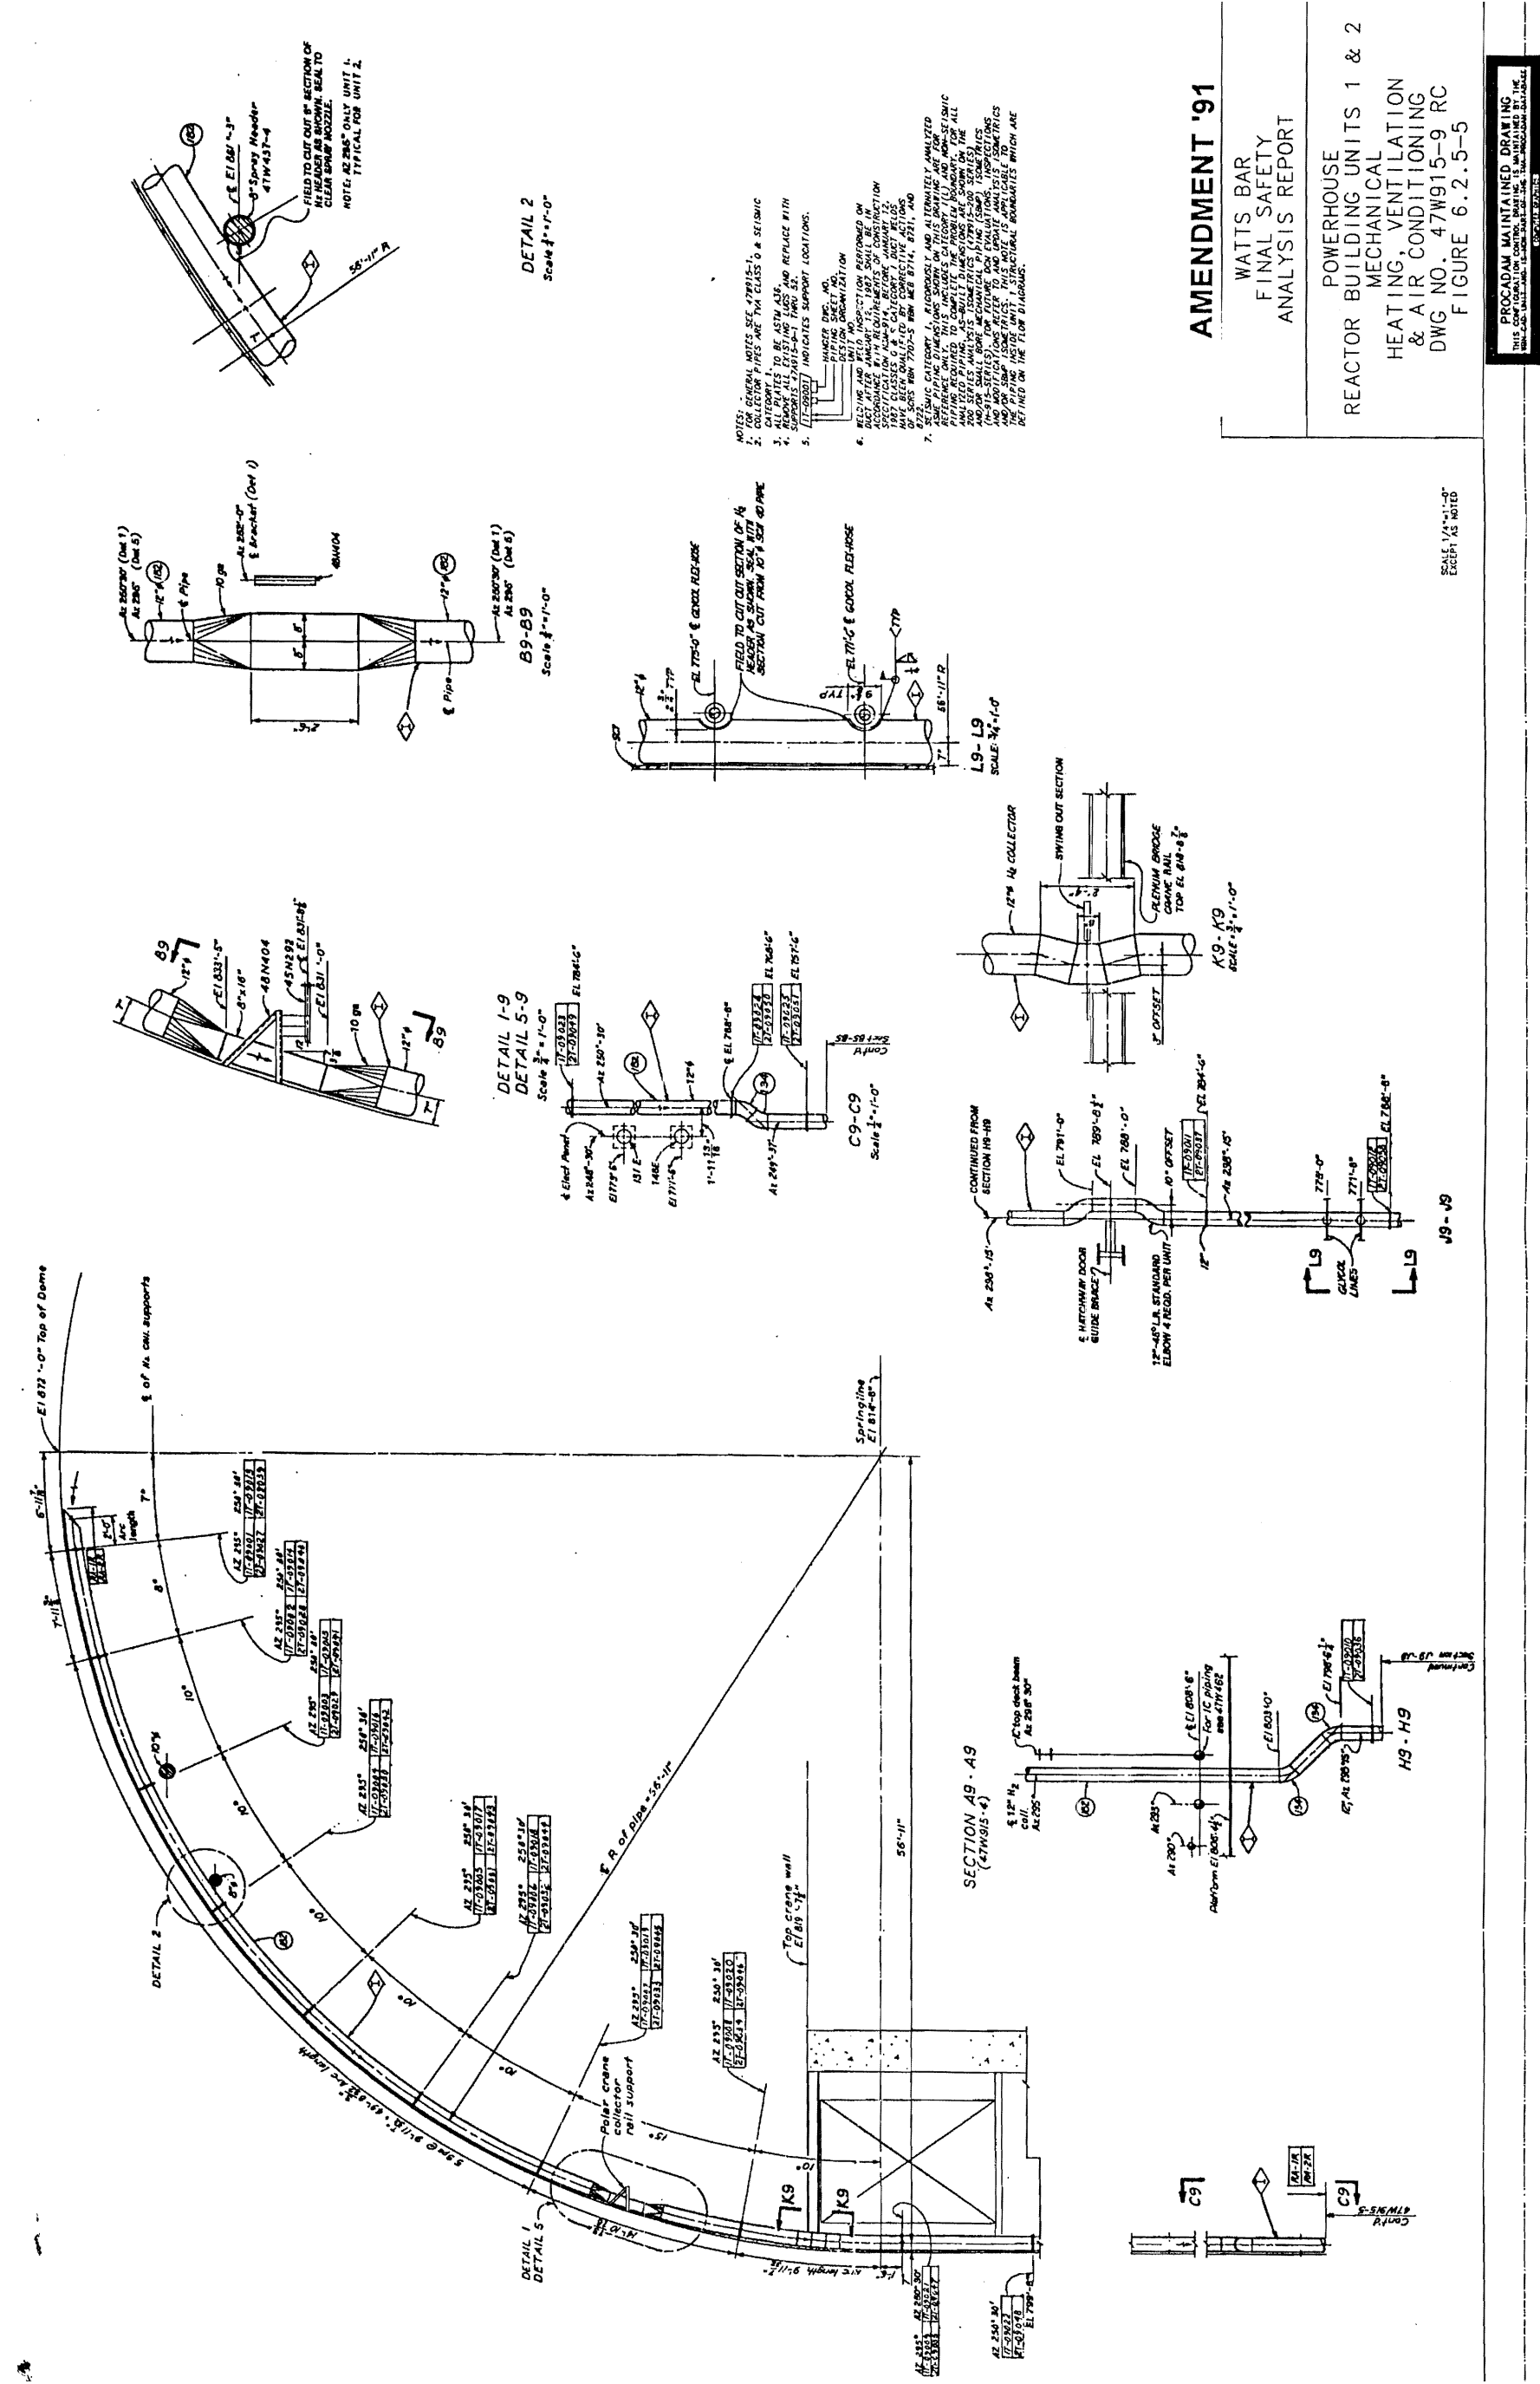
Powerhouse Reactor Building Units 1 & 2 - Mechanical Heating, Ventilating and Air Conditioning
